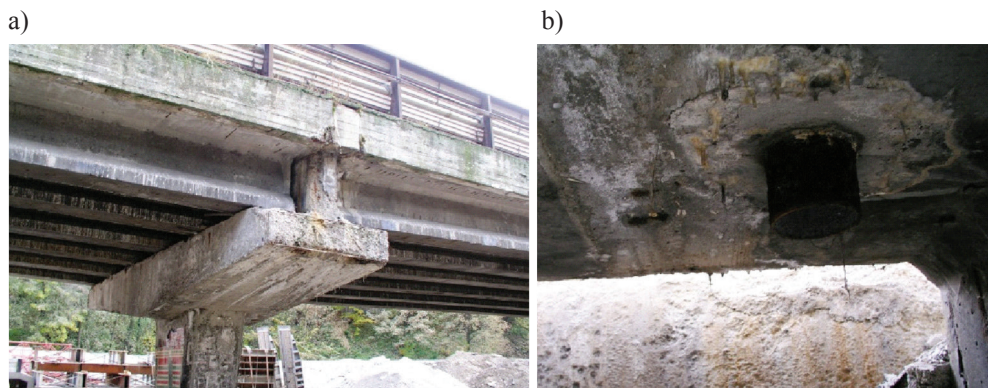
Bridge before repair: a) view of the investigated crosshead in the axis no. 15, b) non-tight collector above the pier cross-beam of bridge
